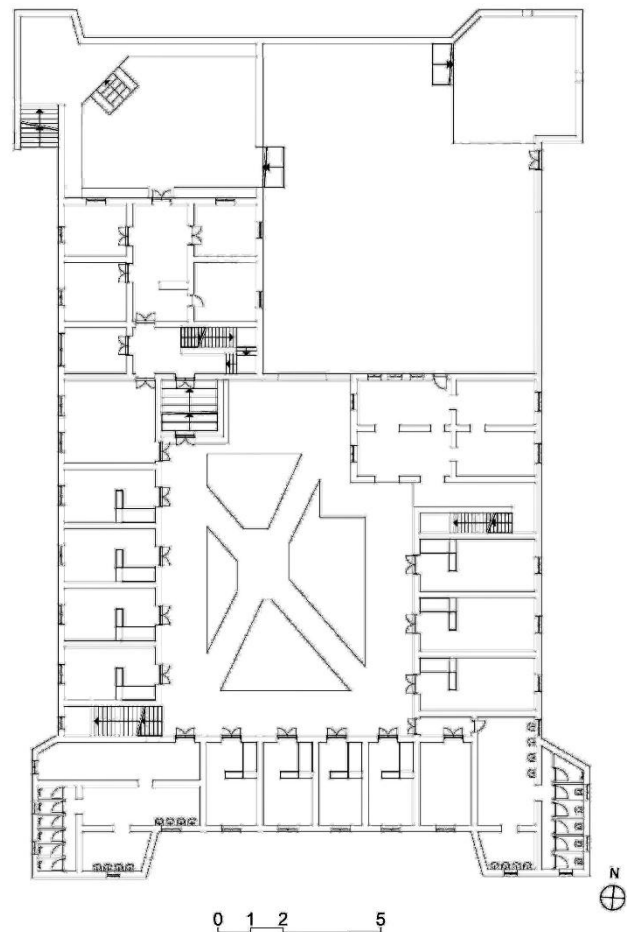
Ground Floor Plan of Bagamoyo Old Fort
